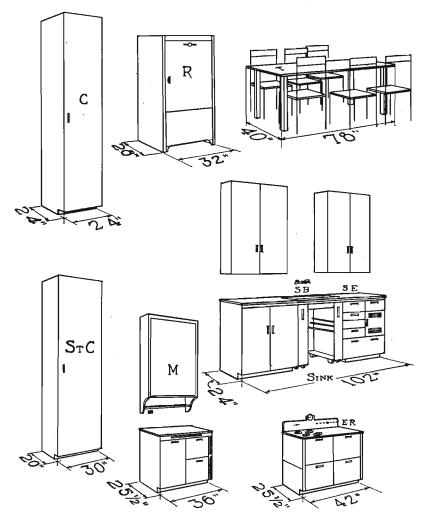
Equipment used in kitchens planned for Problem Two, and shown in Figure 22. C—draft cooler. R—mechanical refrigerator. T—meal table. SB—sink bowl. StC—storage cabinet for utensils and packaged supplies used at the mixing and stove centers. M—mixing table with bins below it and with a storage cabinet above it. Upper cabinet closed by roller shade. ER—electric or gas range.
